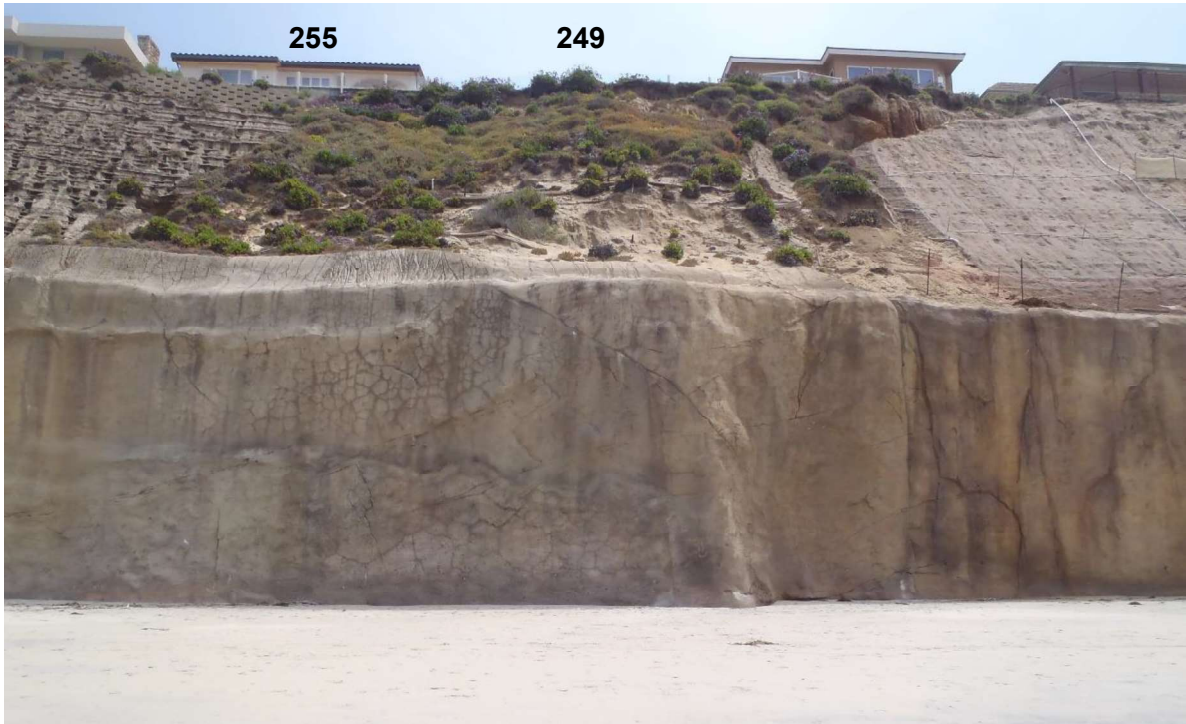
Seawall below 255 to 249 Pacific Avenue (April 26, 2023)
